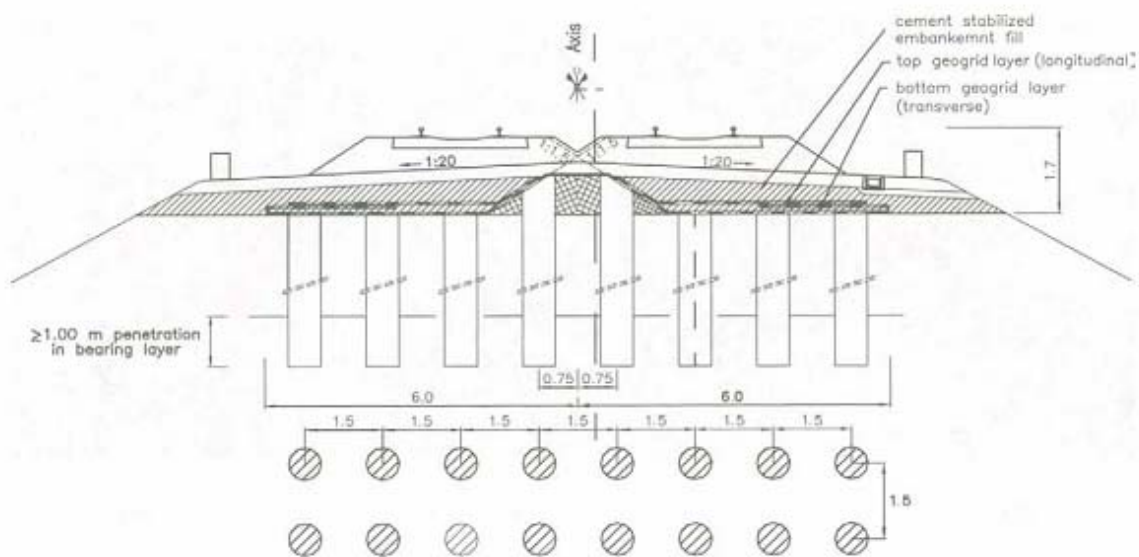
Foundation systems with geotextile encased columns in Büchen-Hamburg (After Kempfert and Raithel, 2005)
